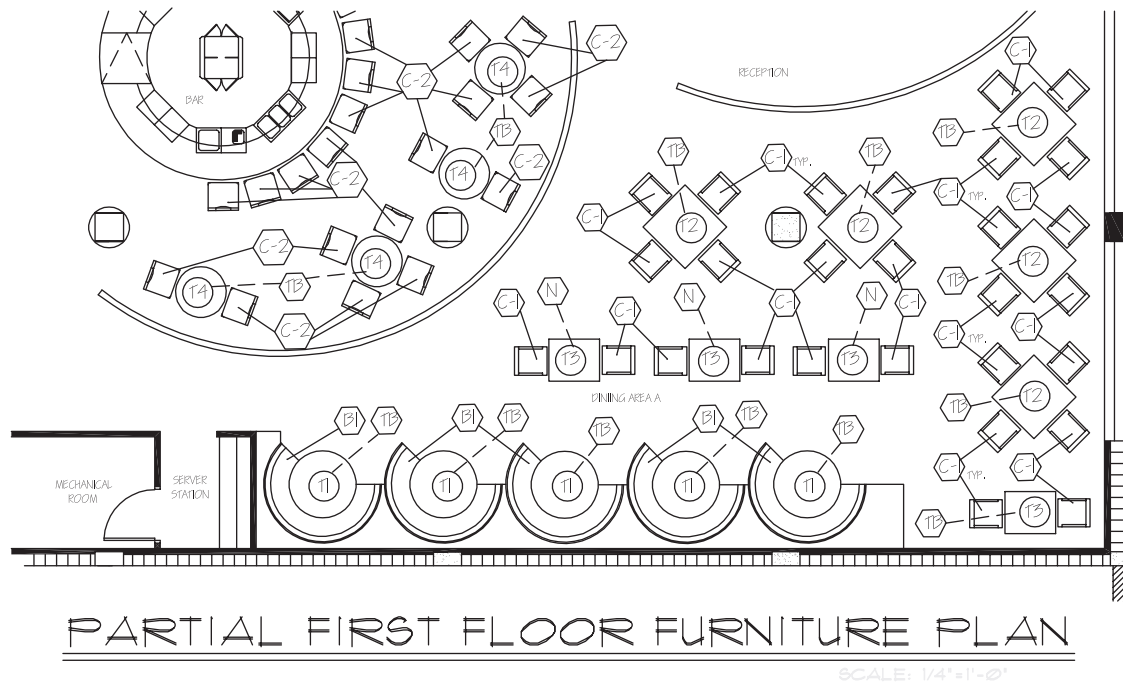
A furniture plan indicates where specific furniture, furnishings, and equipment are to be placed.
